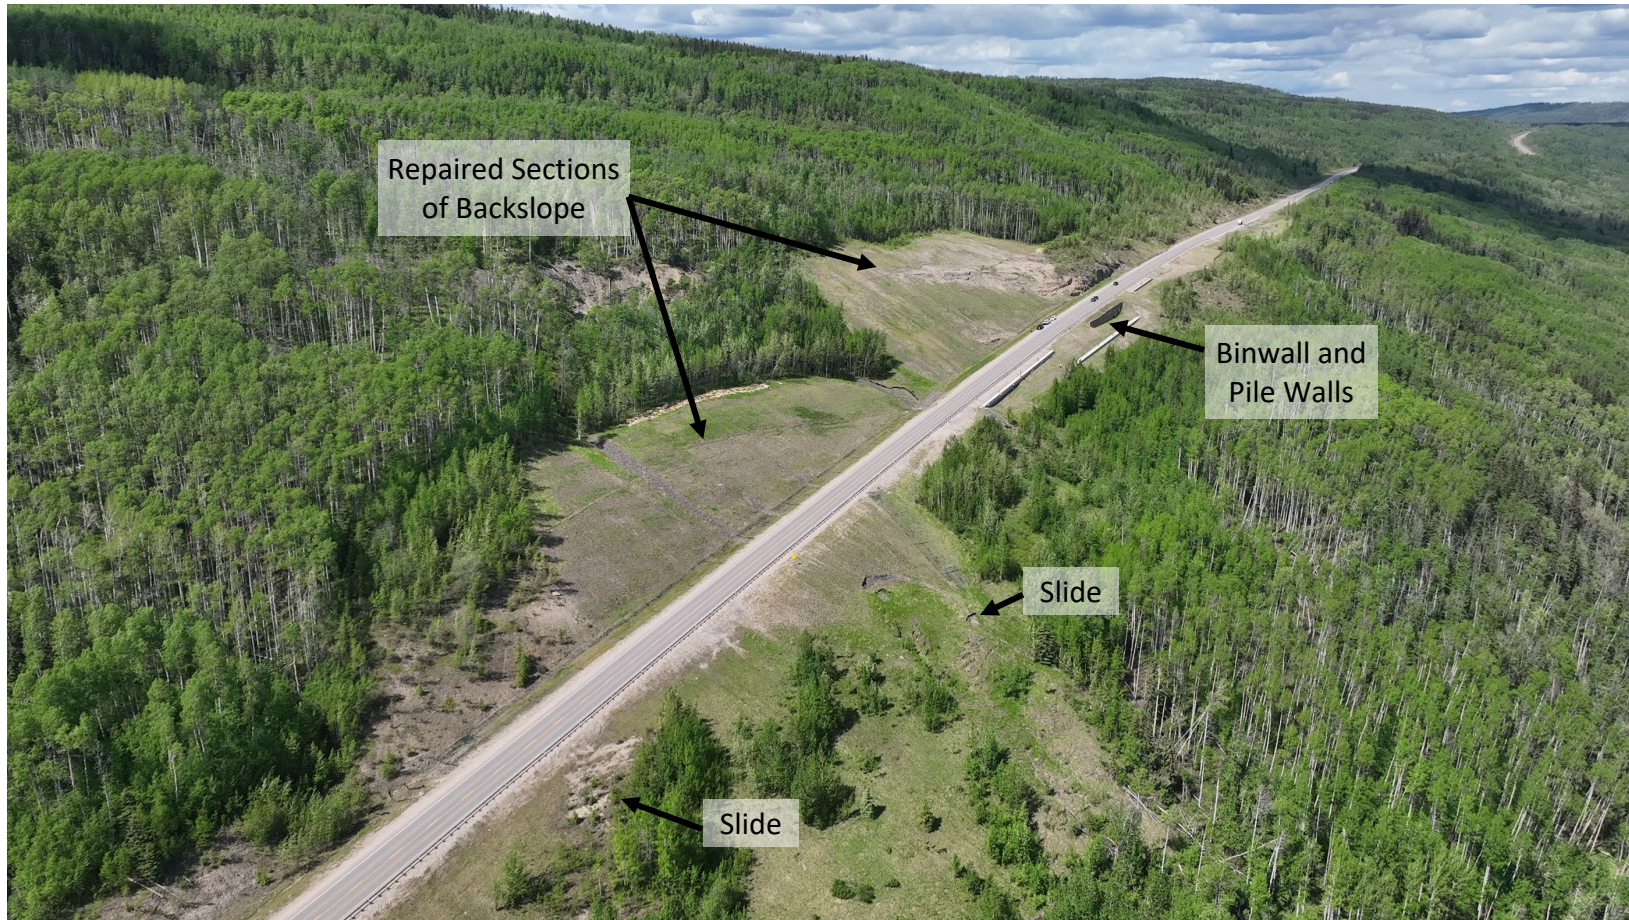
South portion of site. Note slides on east (downslope) side of Hwy 40:36. UAV photo taken June 2, 2025, facing northeast.
